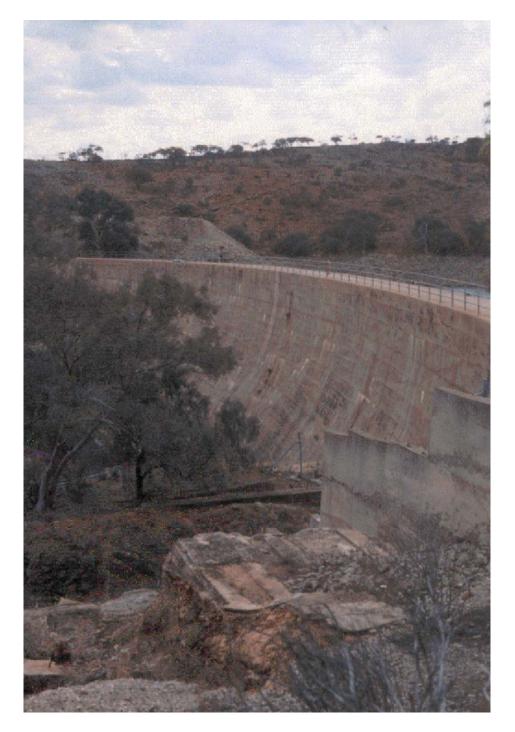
Umberumberka Reservoir from the public viewing point looking at the downstream side of the dam wall. This photograph was taken in September 2002.
